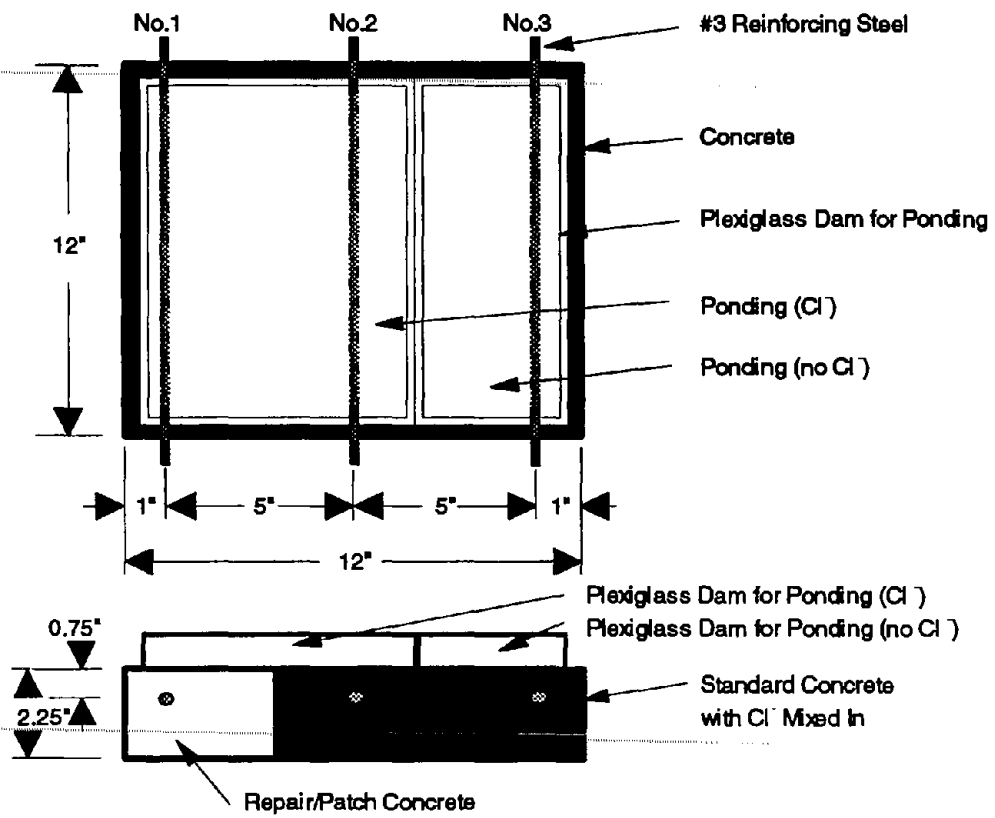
Repair/patch concrete specimen used for task C long-term tests.
